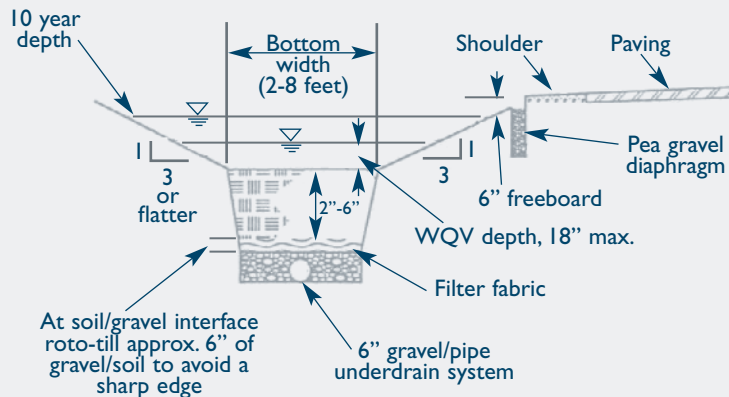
P5-2 Dry Swale – Trapezoidal Cross Section
